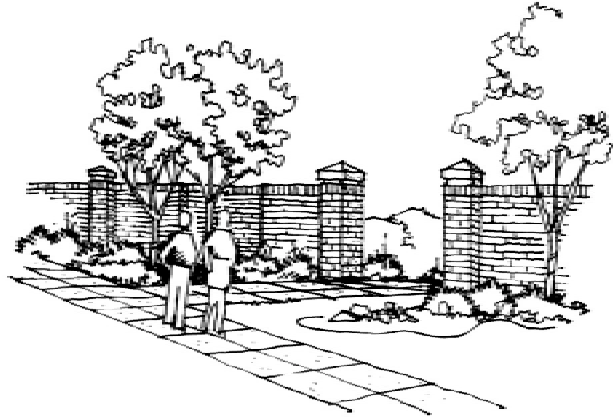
The maximum length of continuous, unbroken, and uninterrupted fence or wall plane shall be 100 feet. Breaks shall be provided through the use of columns, landscaping pockets, transparent sections, and/or a change to different materials.
